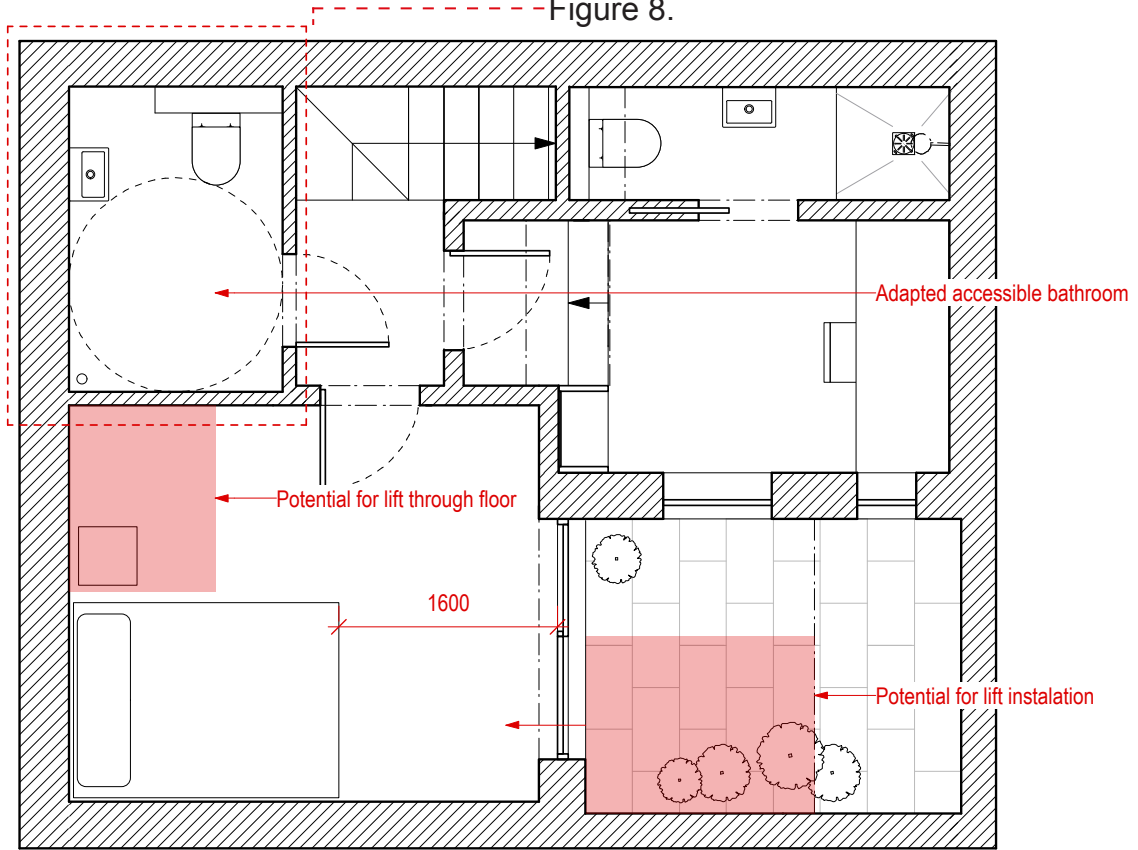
Lower Ground Floor Plan, scale 1:50.
